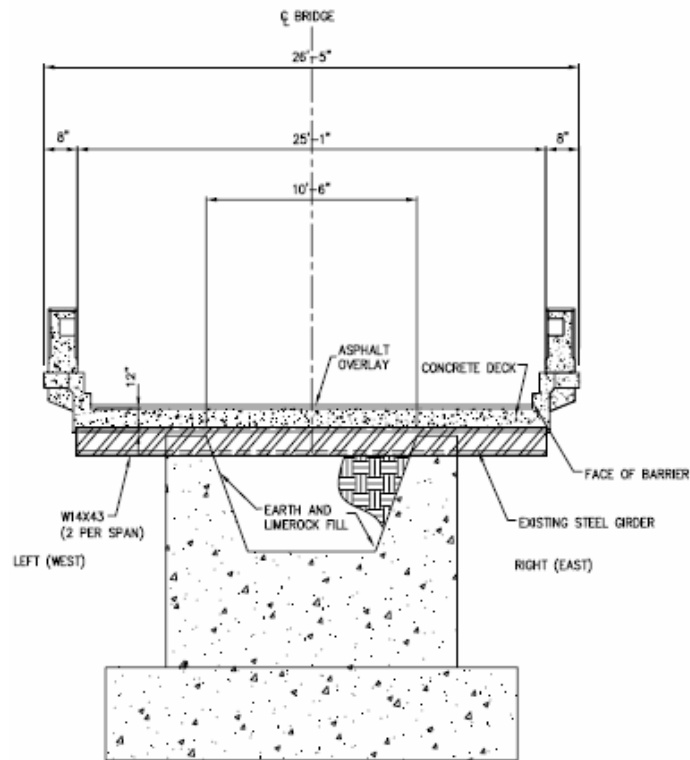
Typical Section for Bow Channel Bridge (Adopted from Registe, Sliger Engineering).
